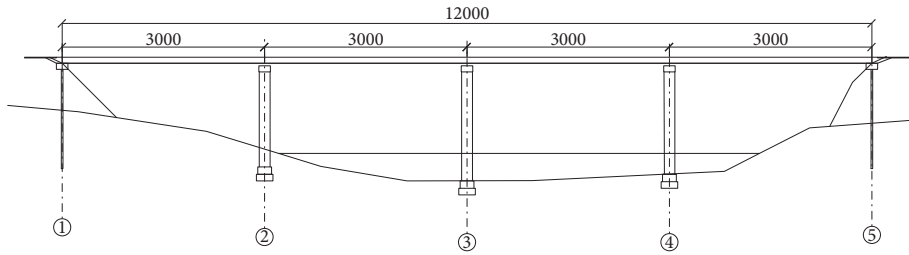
Elevation of Shangban Bridge. (dimensions in cm).
